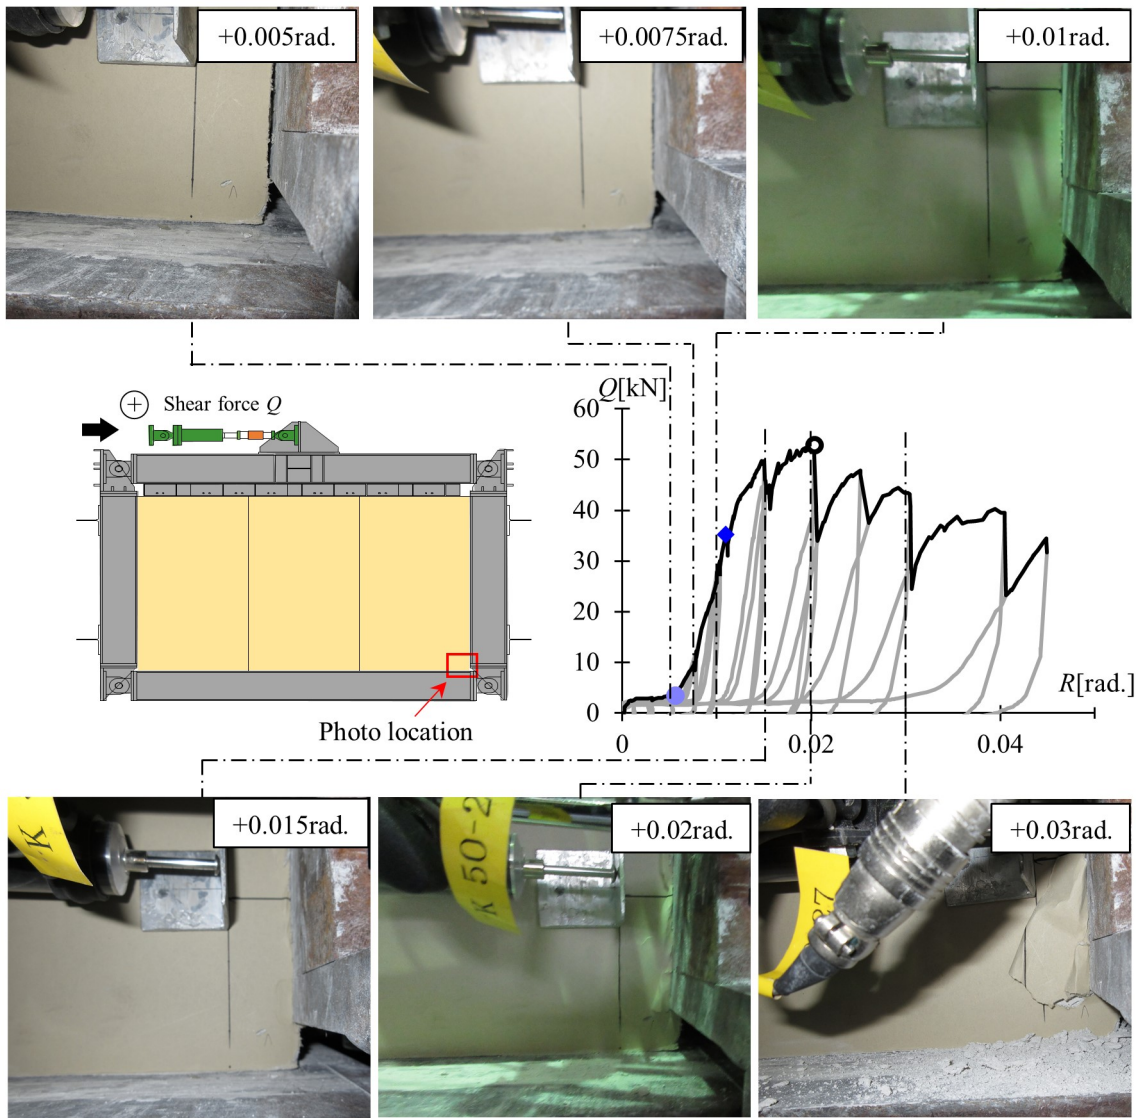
Damage to the gypsum board at loading cycle from 0.005 rad to 0.03 rad (Specimen S12.5\*4, lower right corner, front).
